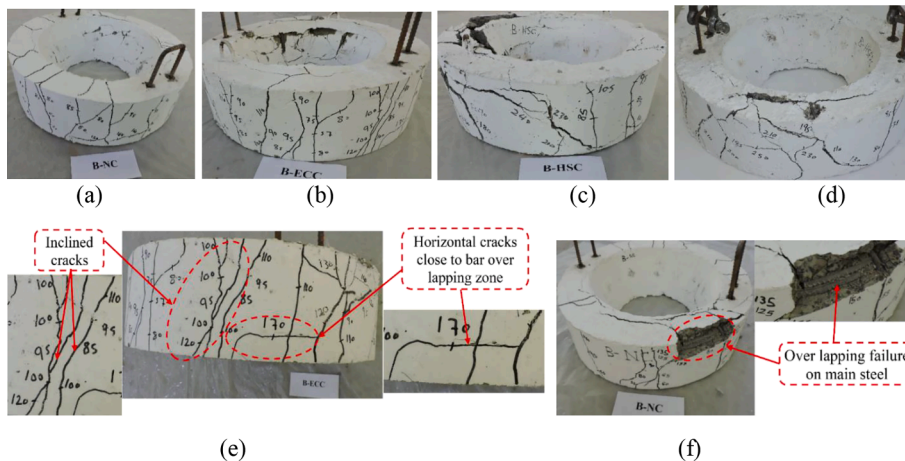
Crack patterns of Group G1: (a) Master beam B-NC, (b) B-ECC, (c) B-HSC, (d) B-HSFRC, (e) Inclined and horizontal cracks encircling the beam's surface, and (f) Over lapping failure of ring steel bar.
